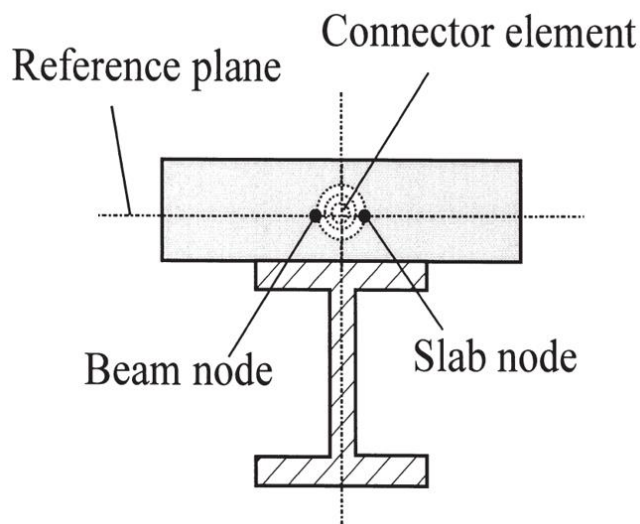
Modelling of composite beam in Vulcan connecting the beam element to the shell elements with a shear connector (Huang, Burgess and Plank, 1999)
